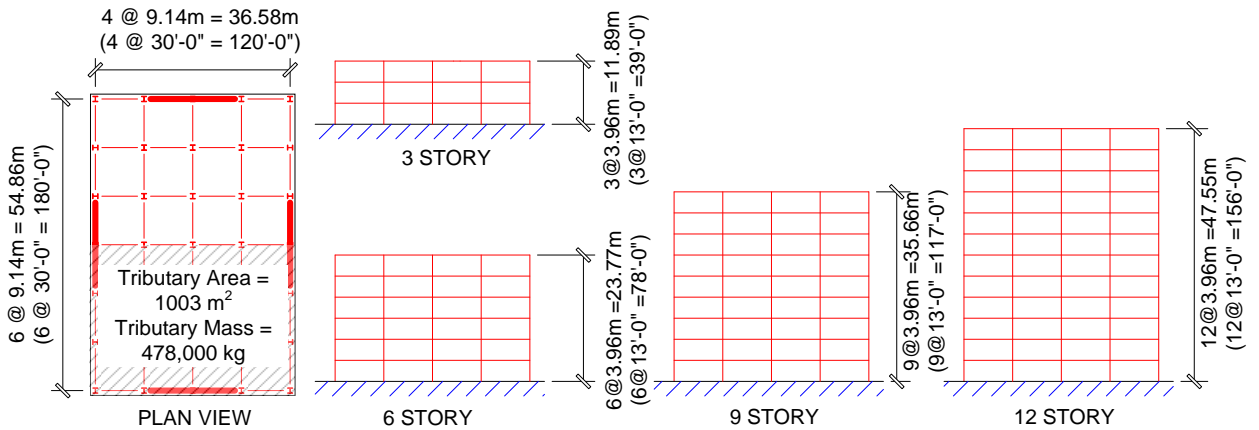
Plan and Elevation of Buildings Used in the Parametric Study
